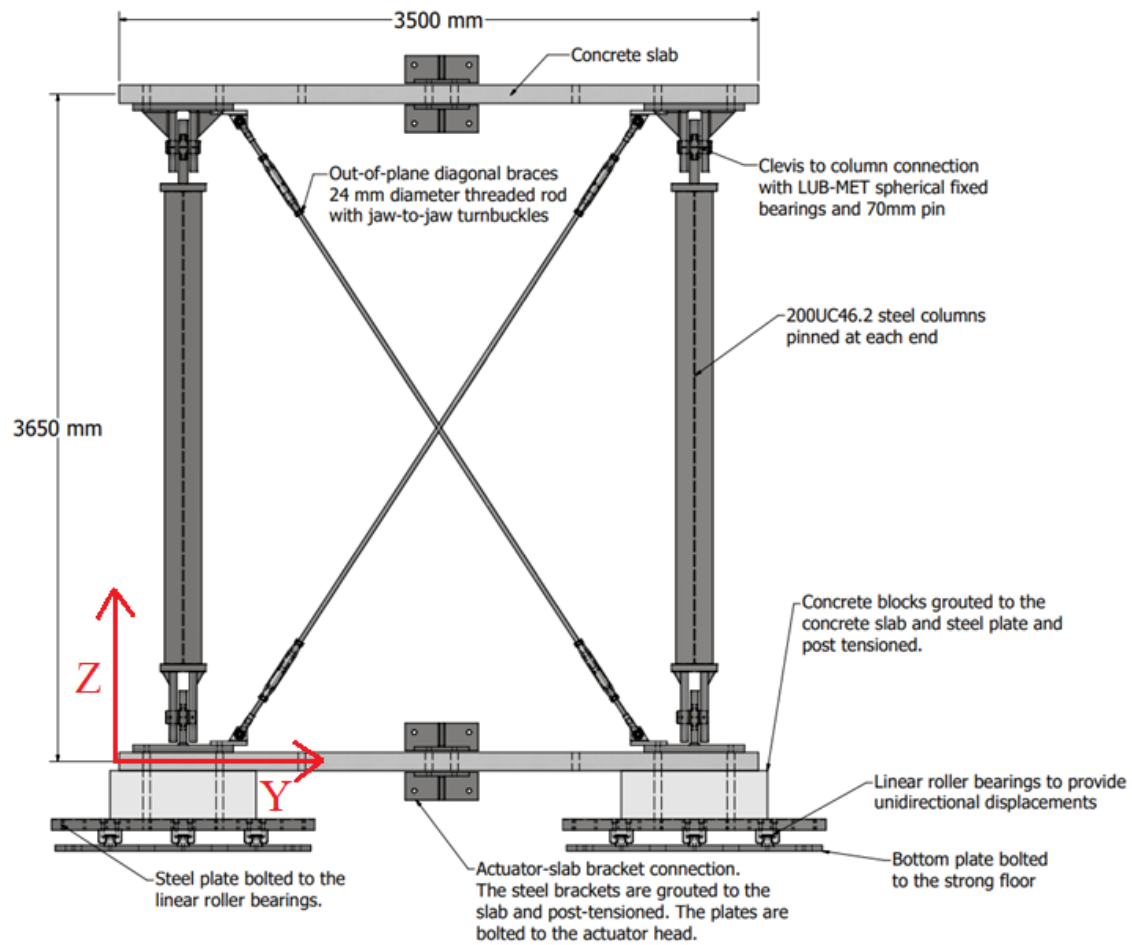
Y-Z elevation of the test setup (Pledger, 2026)
